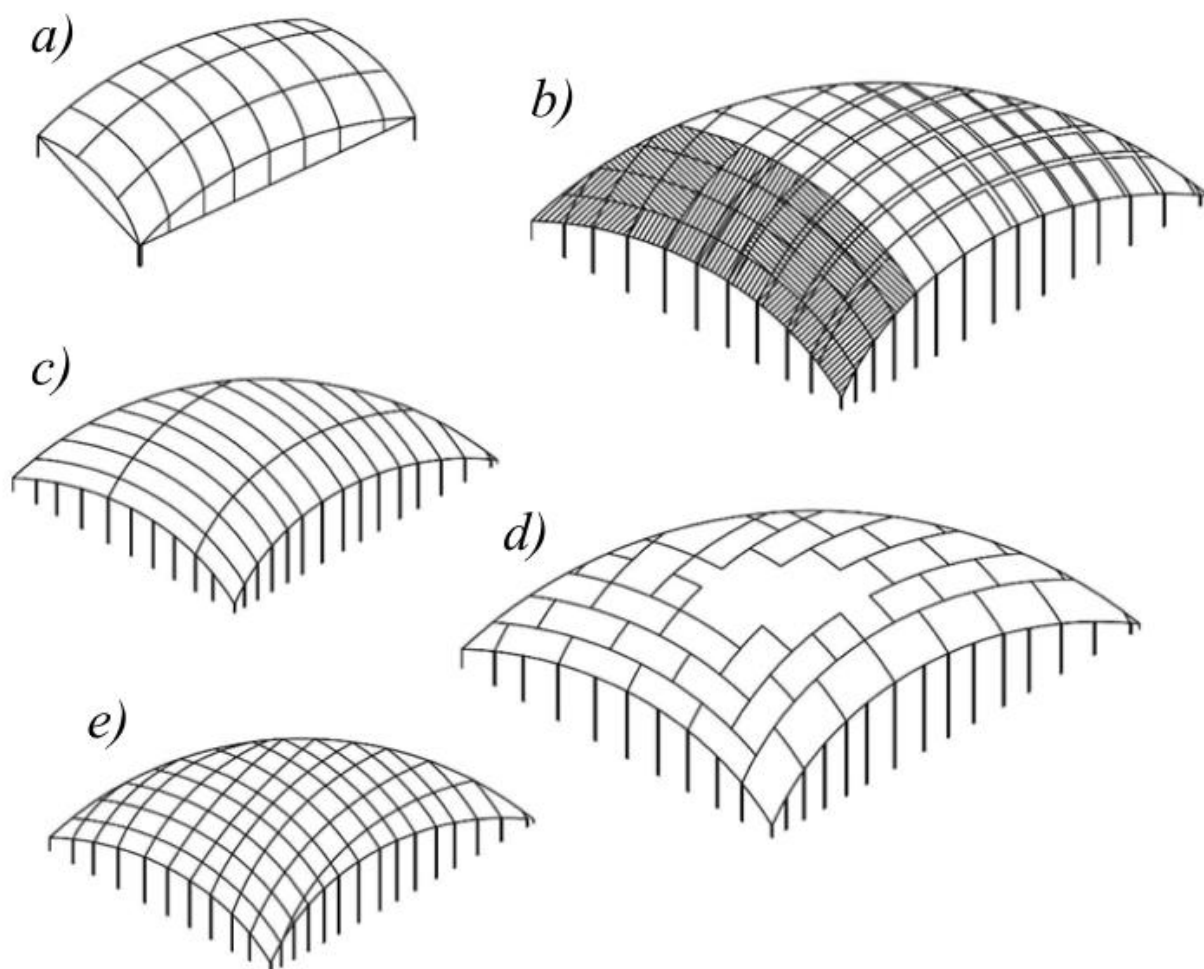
Structural forms of prefabricated reinforced concrete hollow shells:
